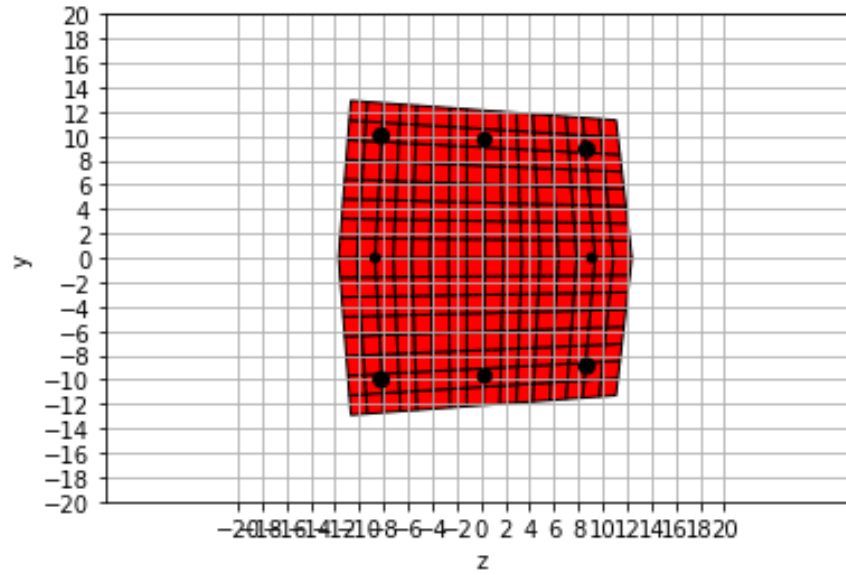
Section of 6'-3" tall cantilever column under investigation.
